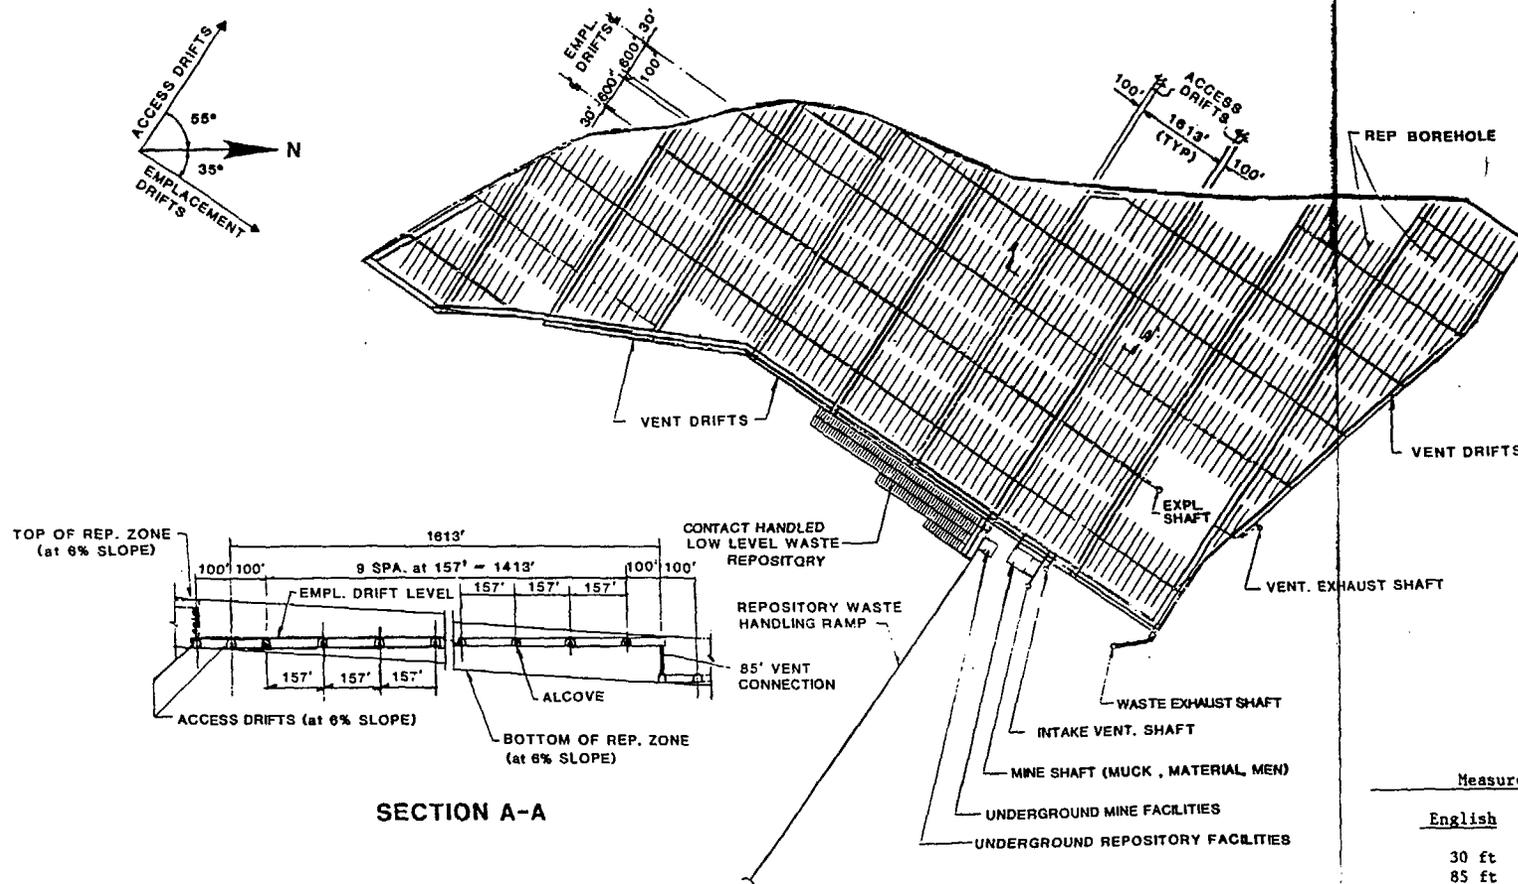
Preliminary Concept for the Underground Layout Using Vertical Emplacement
